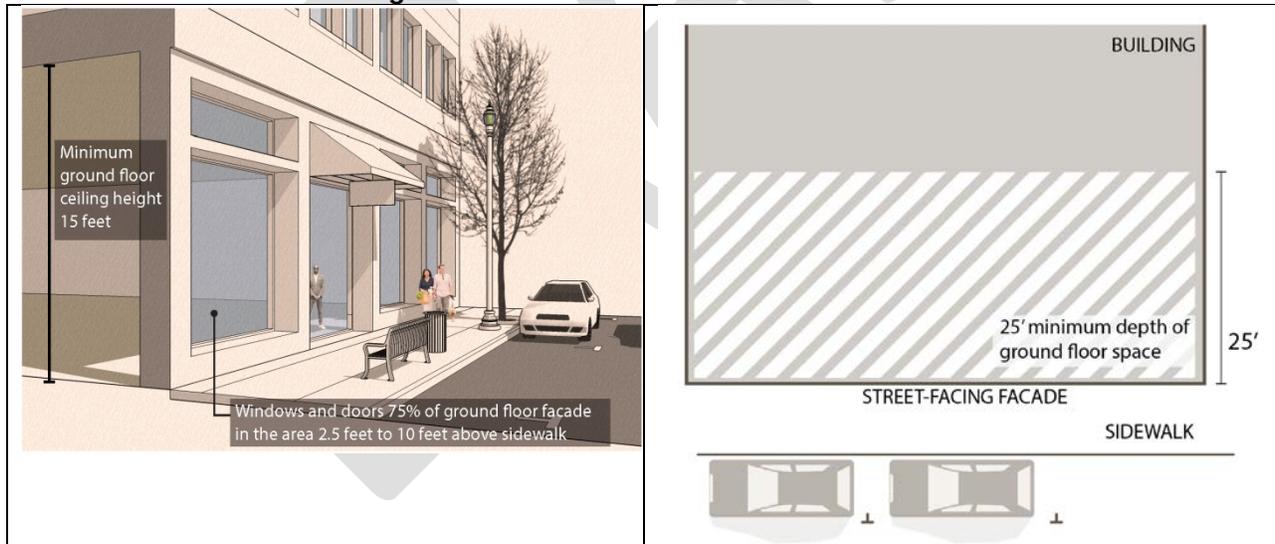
A.2.b. Examples of Ground Floor Active Use space – ceiling height and transparency
